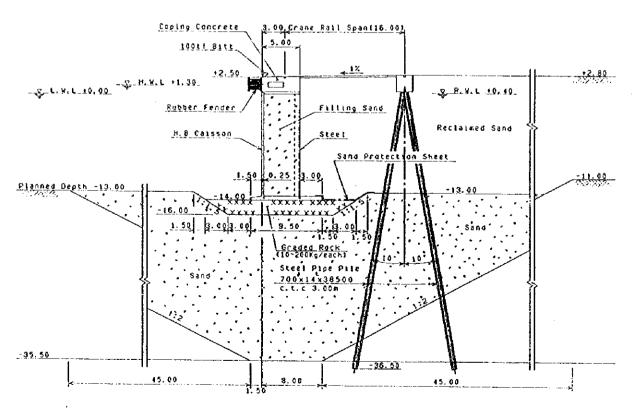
(2) Typical Cross Section of Quaywall W2 (Hybrid Caisson)
